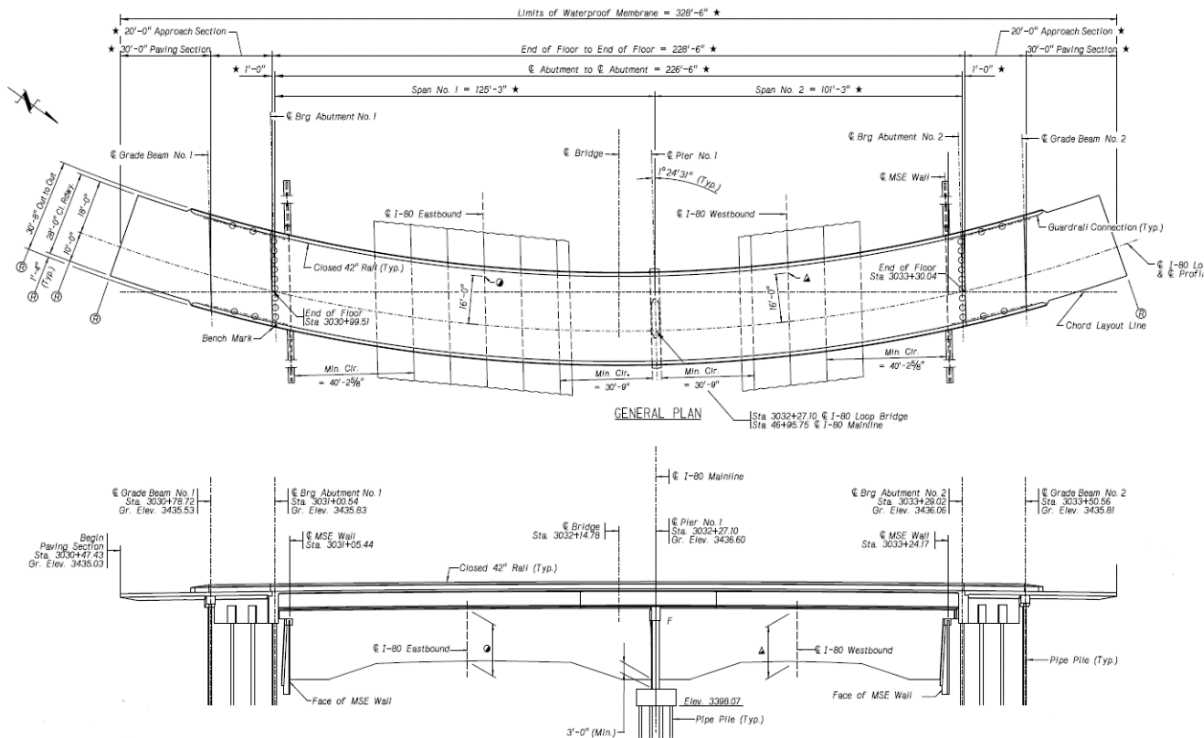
Plan and Elevation Views of the Big Springs Bridge (drawings retrieved from Big Springs West I-80 Loop Bridge)
